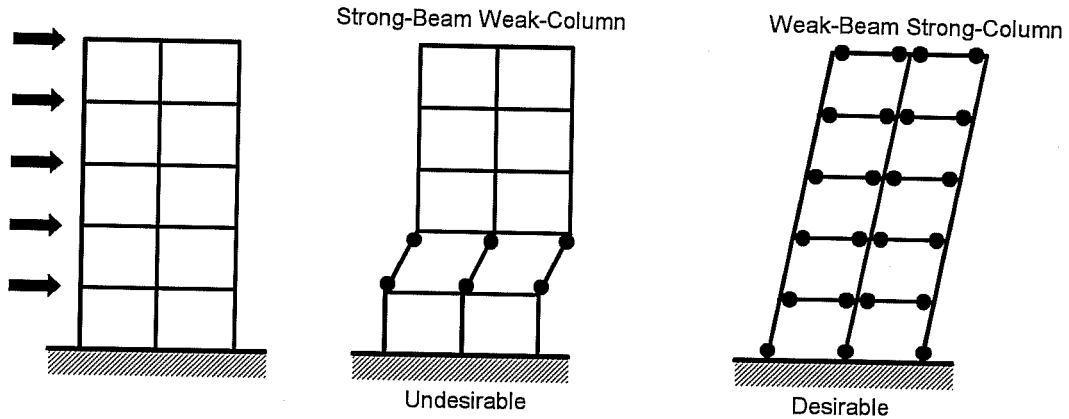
Possible failure mechanisms for frame structures under lateral loads.
